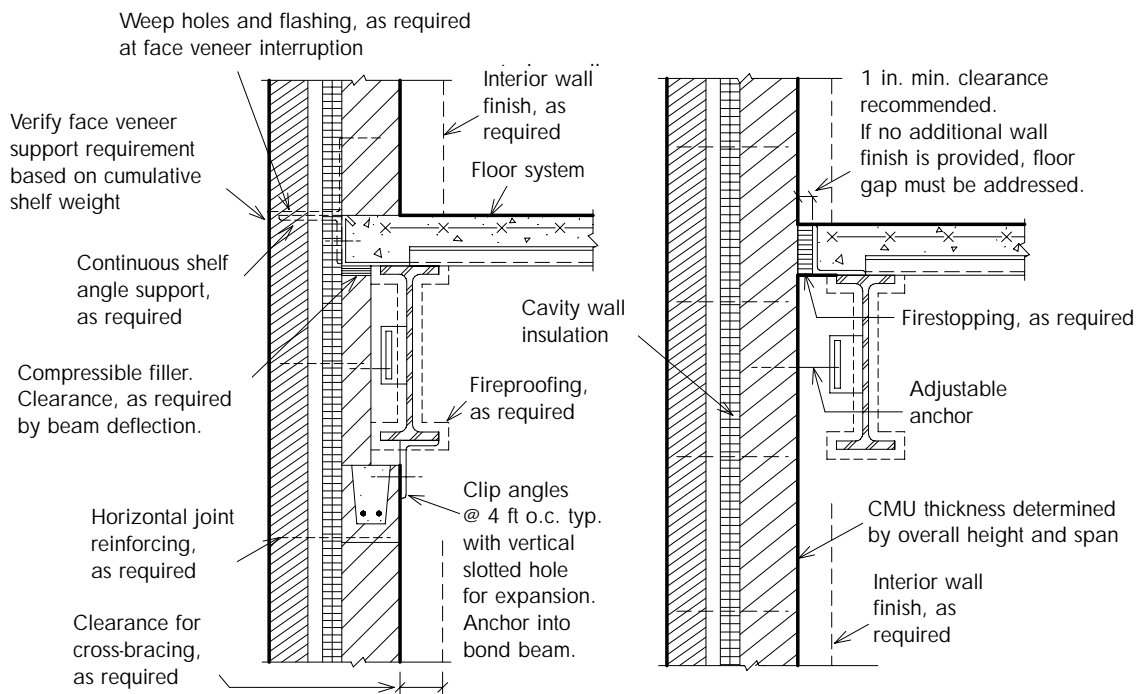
Detailing Considerations for Masonry (Sample Wall Section Details at Floor)
